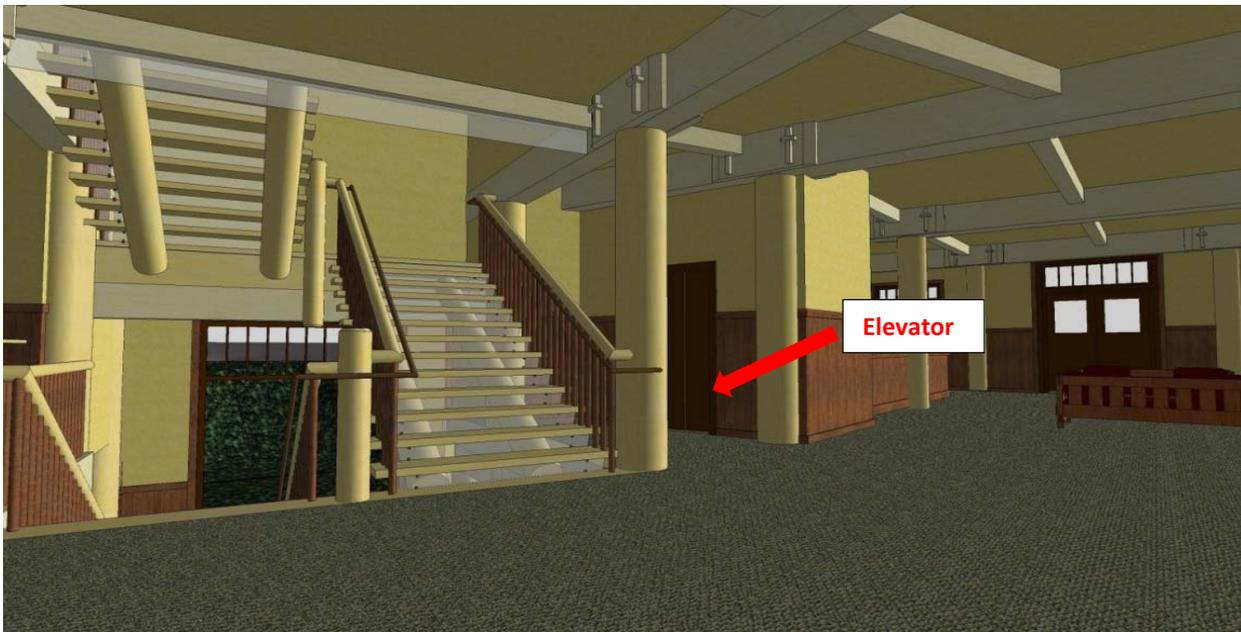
FIRST FLOOR STAIRWELL WITH SAFETY AND ACCESSIBILITY IMPROVEMENTS, INCLUDING ELEVATOR
